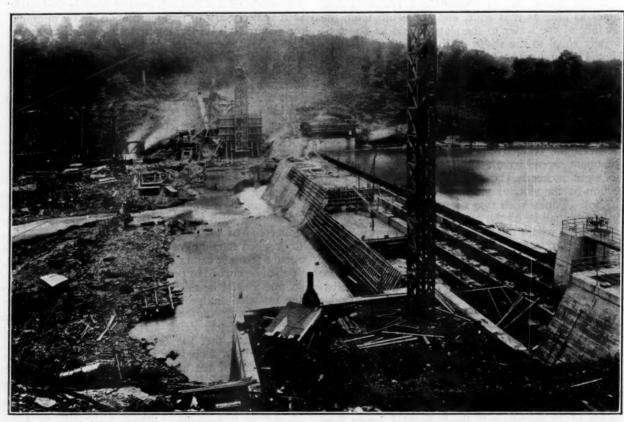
VIEW OF LOCH RAVEN DAM CONSTRUCTION, LOOKING TOWARD WEST END
